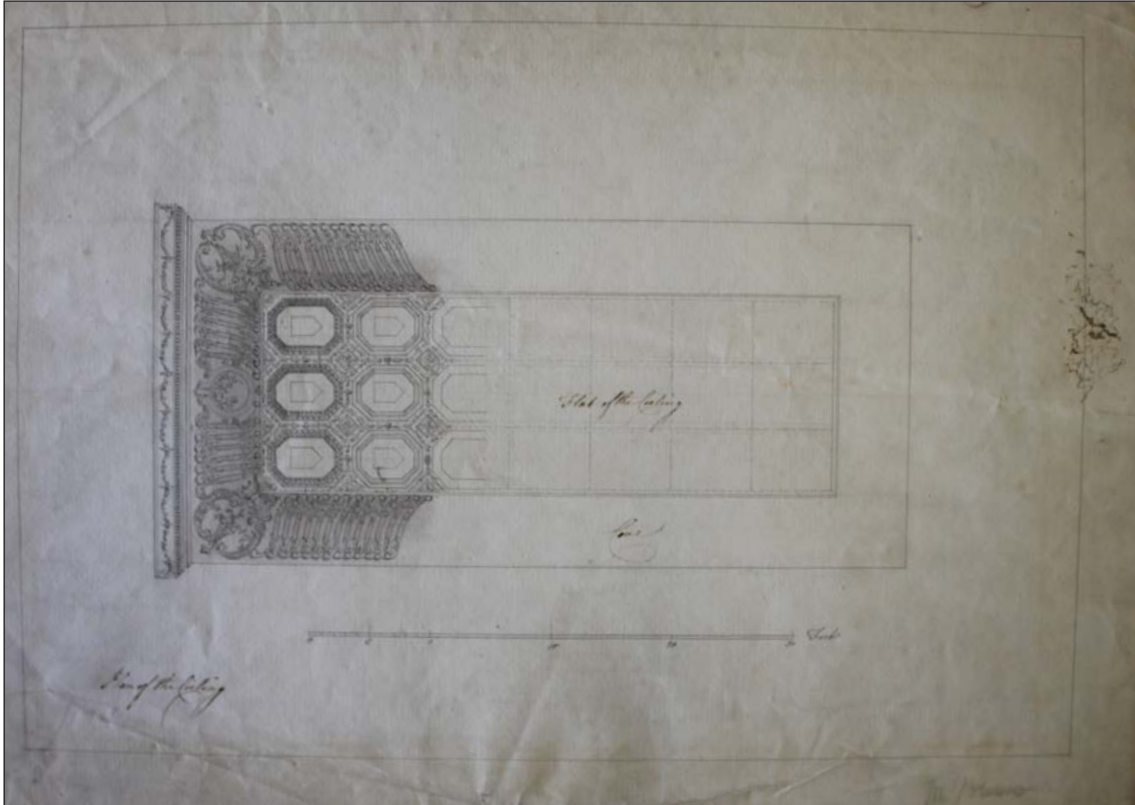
Ceiling design, Burton Constable Hall, East Yorkshire, 1750
